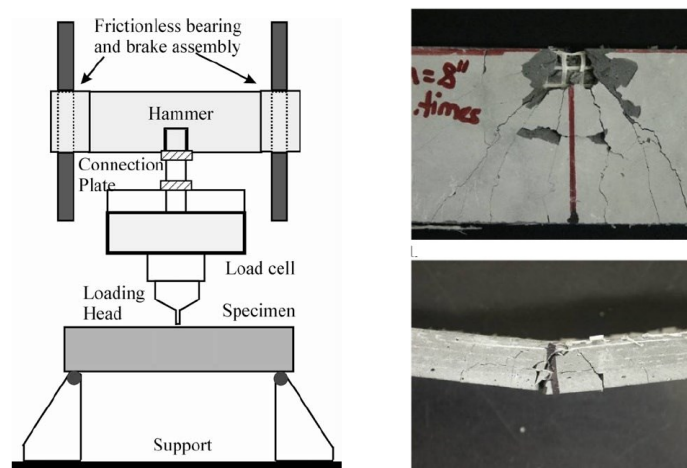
Test setup (left) and test results, beam specimen (right-up) and plate specimen (right-down) (Zhu et al., 2009).
